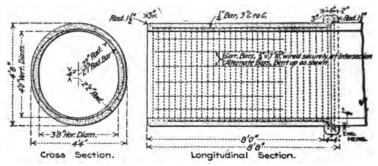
REINFORCED CONCRETE CULVERT PIPE, C. B. & Q. R. R.
